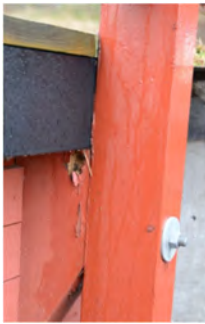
Bad detail, railing post attachment, sheet metal cladding is missing and wooden distance have severe decay damage.
